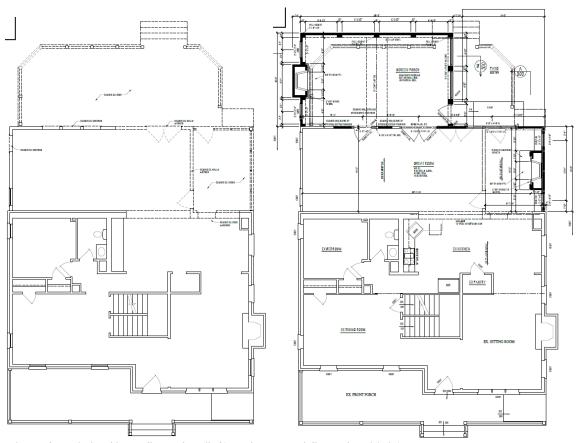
Existing/demo floor plan (left) and proposed floor plan (right).
